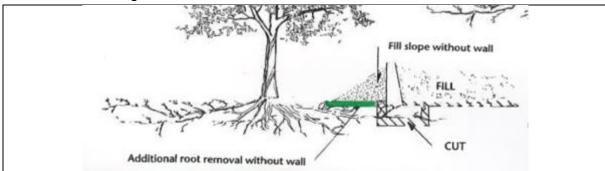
Image B: An image from A technical guide to preservation of trees during land development, ¹¹ showing how retaining walls can be used to limit fill inside the TPZ.
